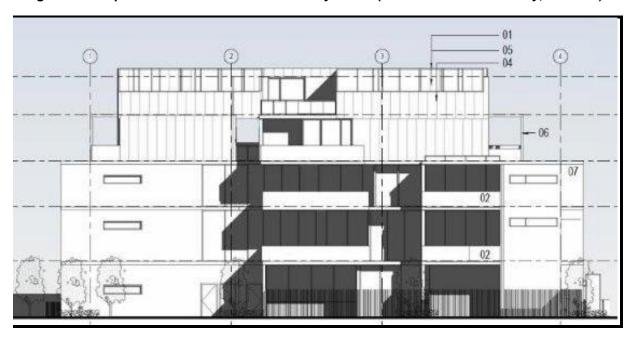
Proposed North Elevation - rear (Source: Brewster Murray, 13/10/17)
